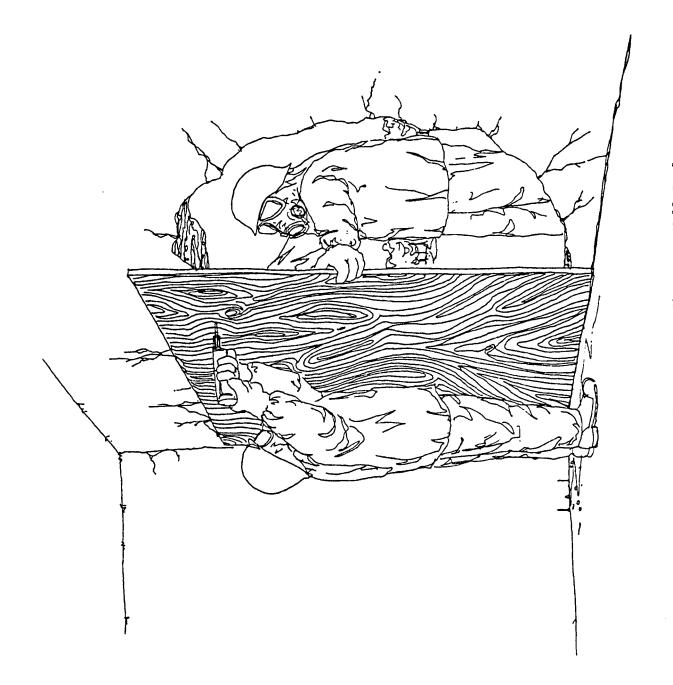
Backing Damaged Area During Shotcrete Wall Replacement.
